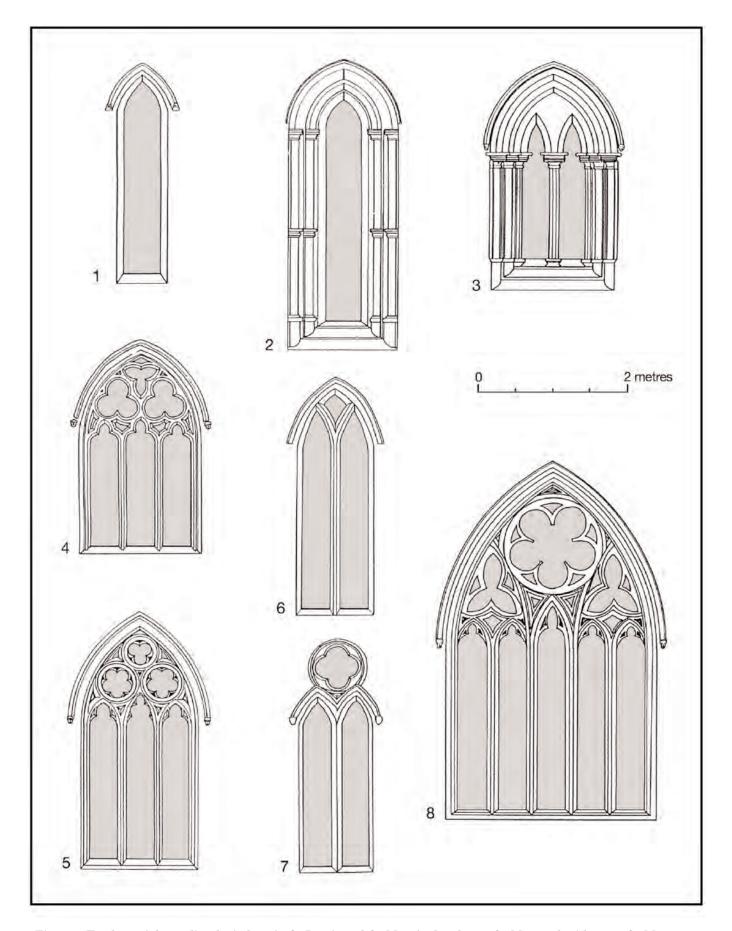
Typology of the medieval windows in St Peter's and St Mary's churches. 1 St M., north aisle; 2, 3 St M., tower; 4 St P., south aisle; 5 St M., south nave aisle; 6 St M., chancel north wall, bay 3; 7 St M., chancel north wall, bay 2; 8 St M., chancel, east wall. Scale 1:50. After Bryant 2003
